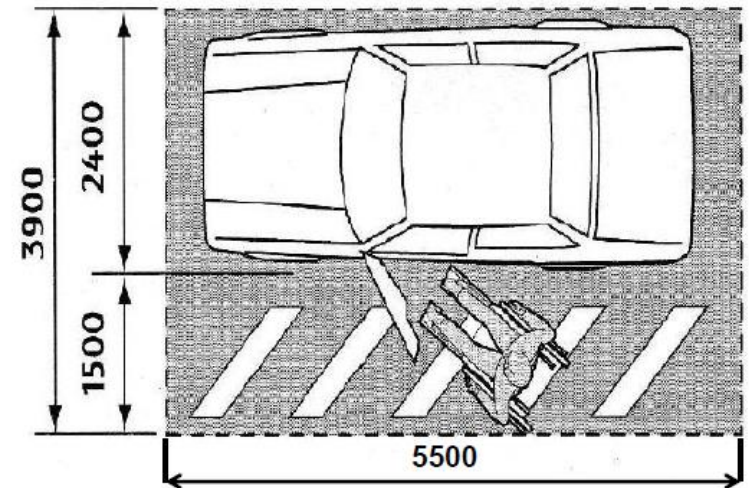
Barrier-Free Parking Space Dimensions – single space
